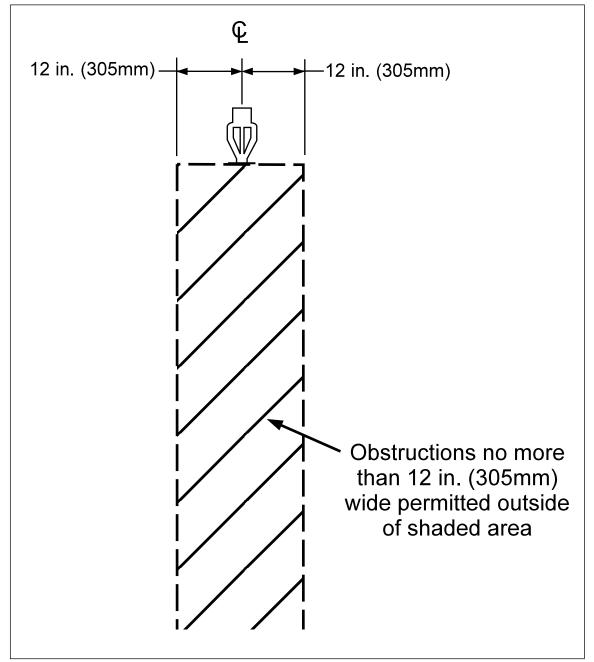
Obstructions below sprinklers no wider than 1 ft (305 mm).
